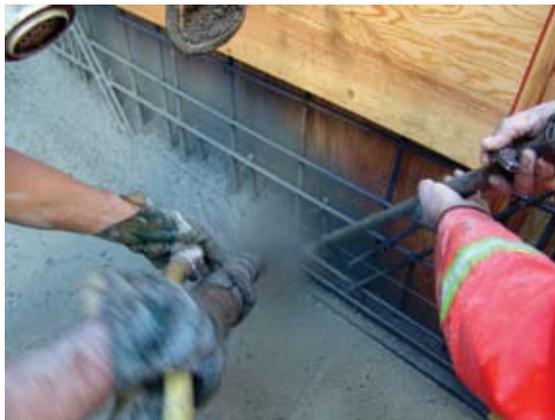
A nozzleman following a blow pipe operator and using proper techniques at the construction joint
